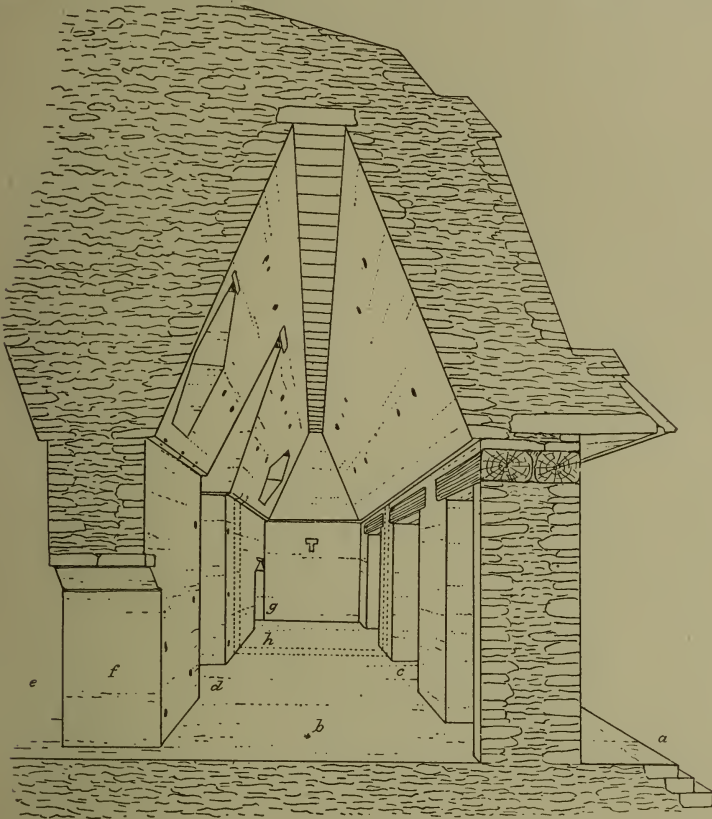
SECTION AND PERSPECTIVE OF OUTER VAULT OR VESTIBULE, TEMPLE OF THE SUN; LOOKING NORTH.
